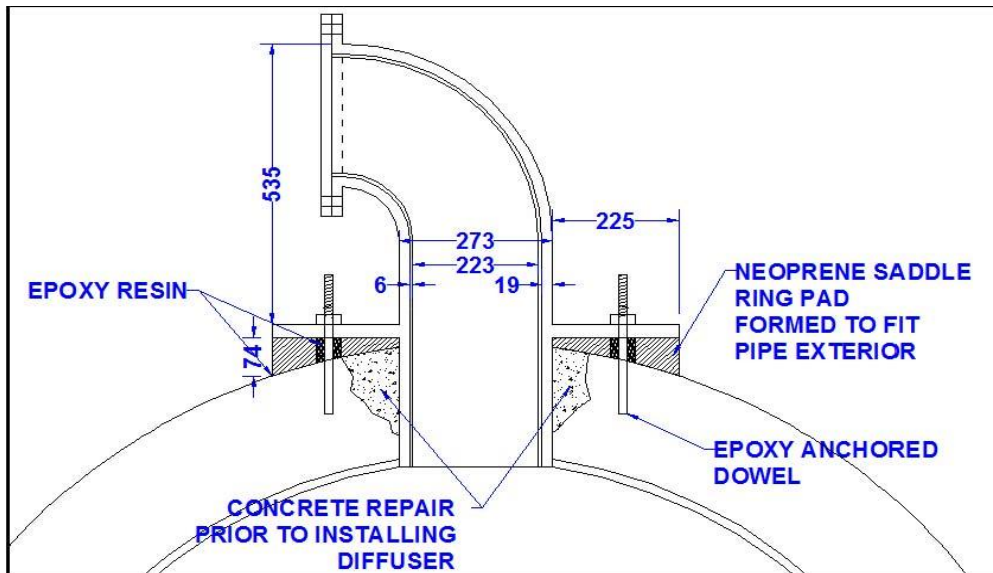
Proposed diffuser installation on the concrete pipe skin
